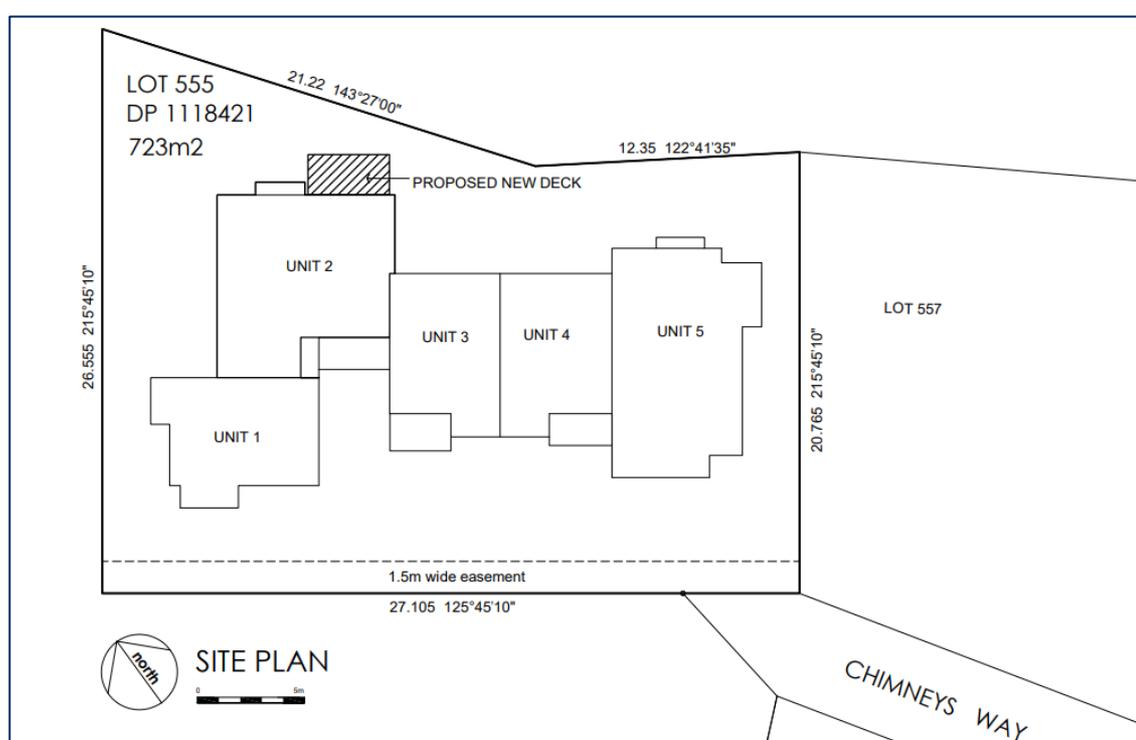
| Site Plan of Aspen Creek Apartment complex (Source: Applicant's documentation)
